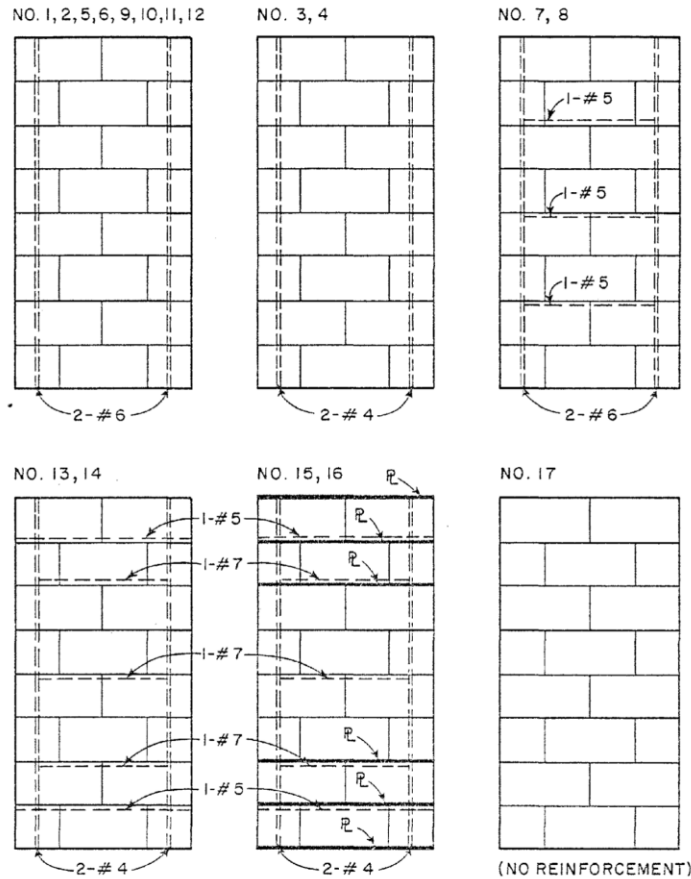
Masonry Double-Pier Specimens Geometry and Reinforcement Details (Mayes et al., 1976a)
